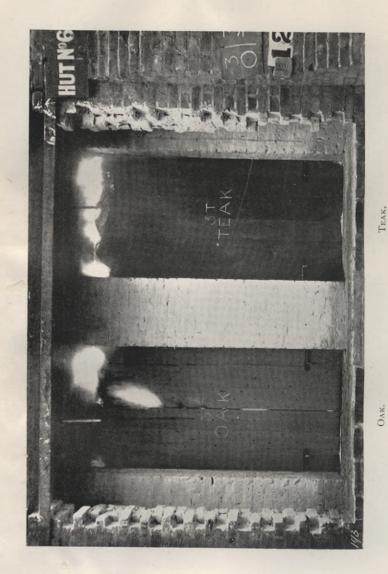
Fig. L. VIEW SHOWING CONDITION OF DOORS AFTER 72 MINUTES,
